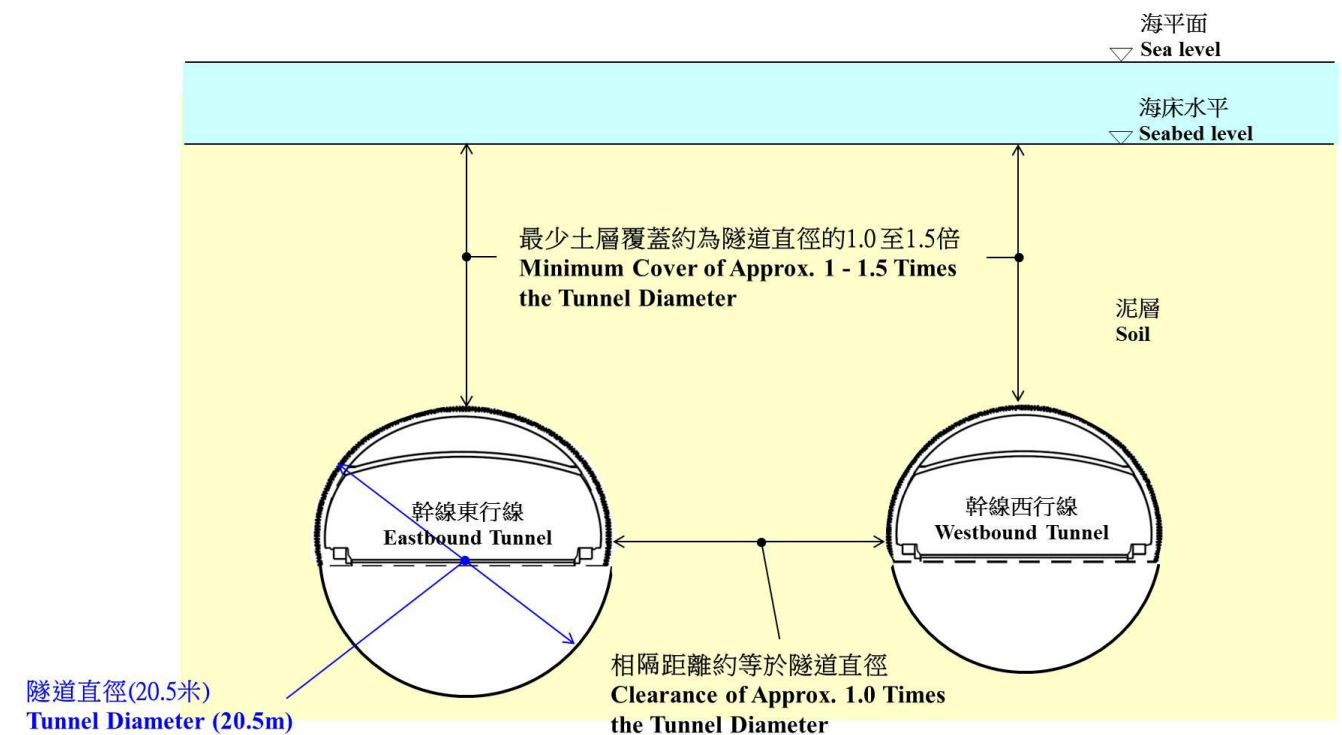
Required Soil Cover for Tunnel Boring Machine
